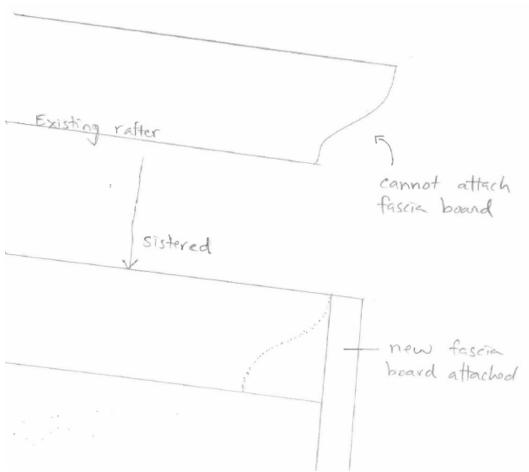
The proposal will sister the existing rafter and attach a facia board to the new sistered rafter tail.
